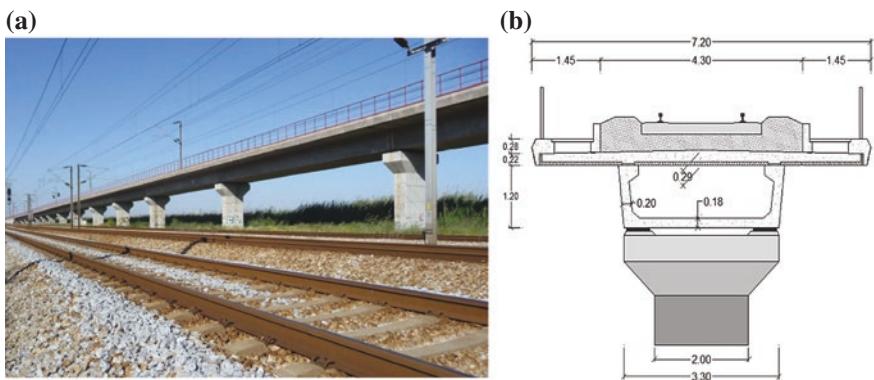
Alverca viaduct: a perspective view; b cross-section of the deck
